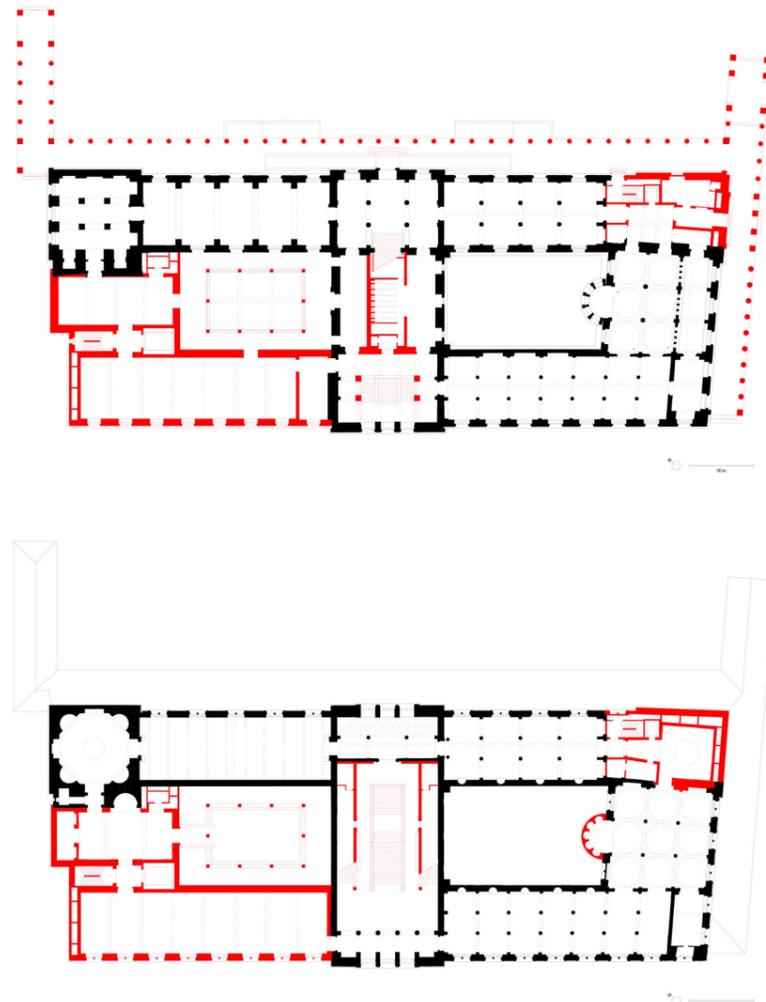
Ground Floor Plan and First Floor Plan, New Elements Marked in Red. <https://davidchipperfield.com/projects/neues-museum>
